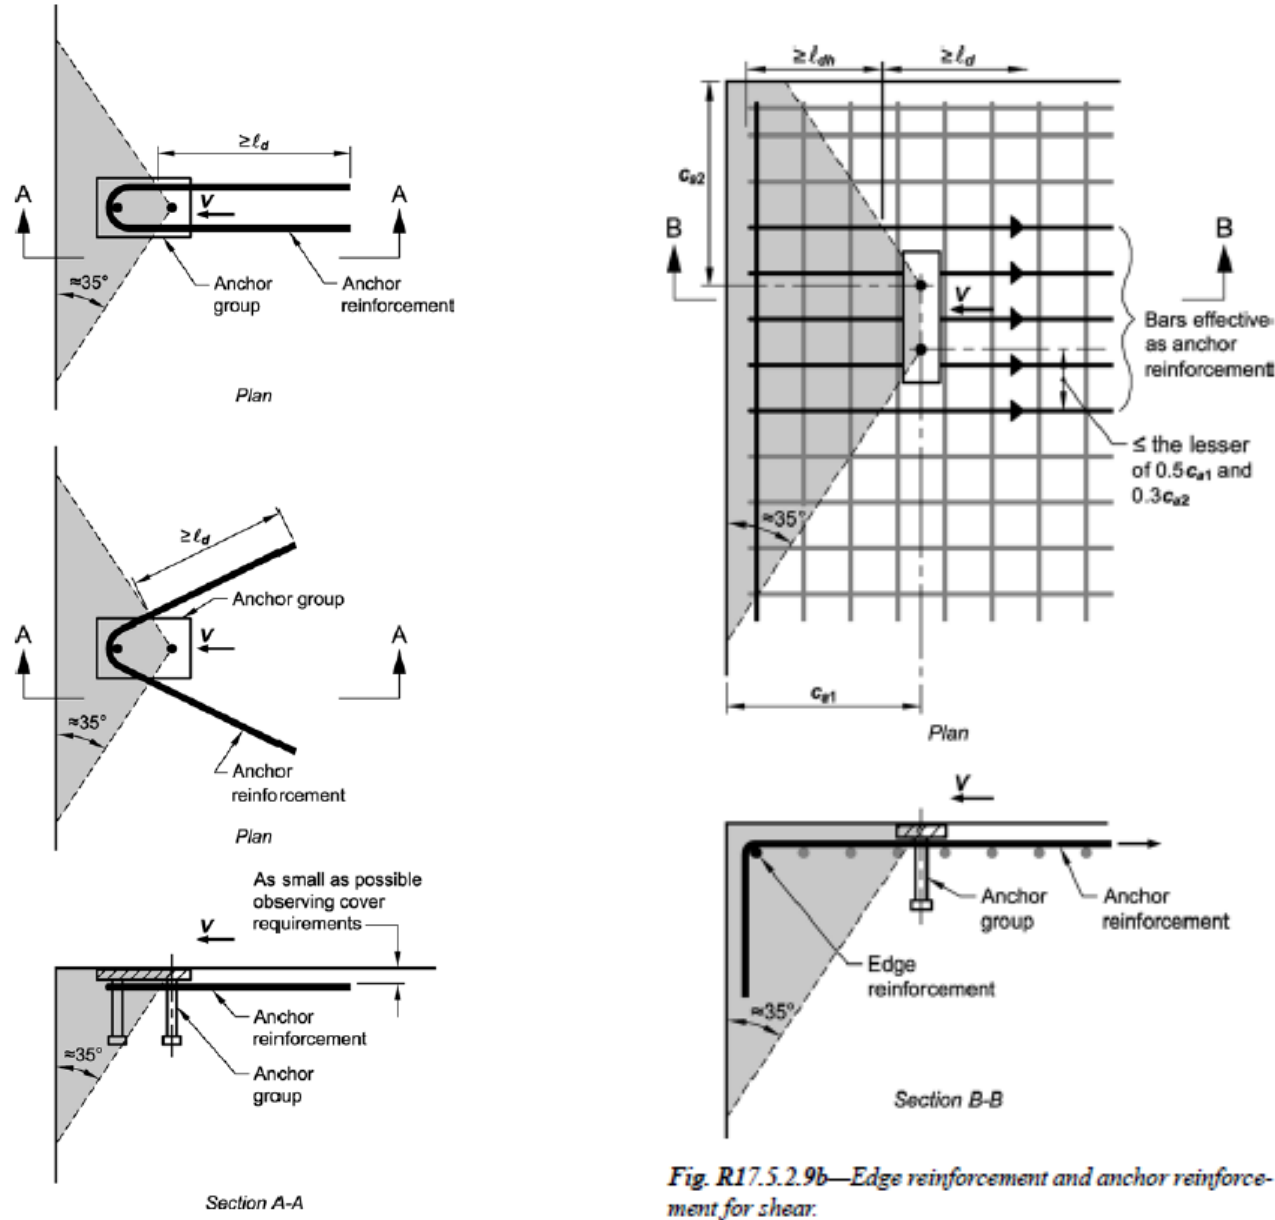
Hairpin anchor reinforcement for shear.
